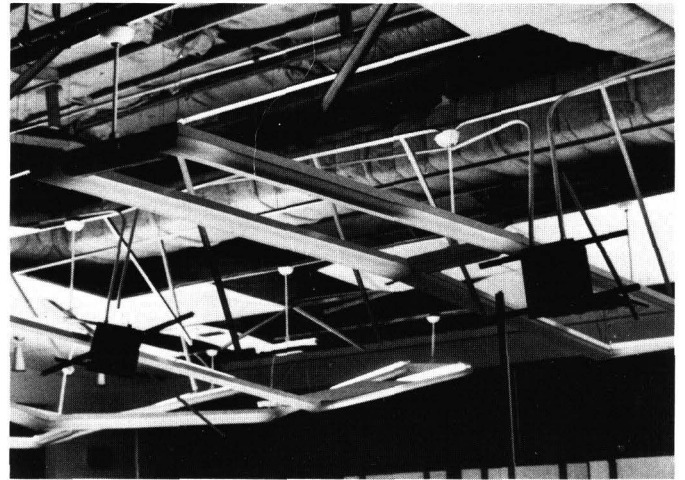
Soledad Canyon School, T-bar ceiling, and light fixtures. J. F. Meehan, photograph.
